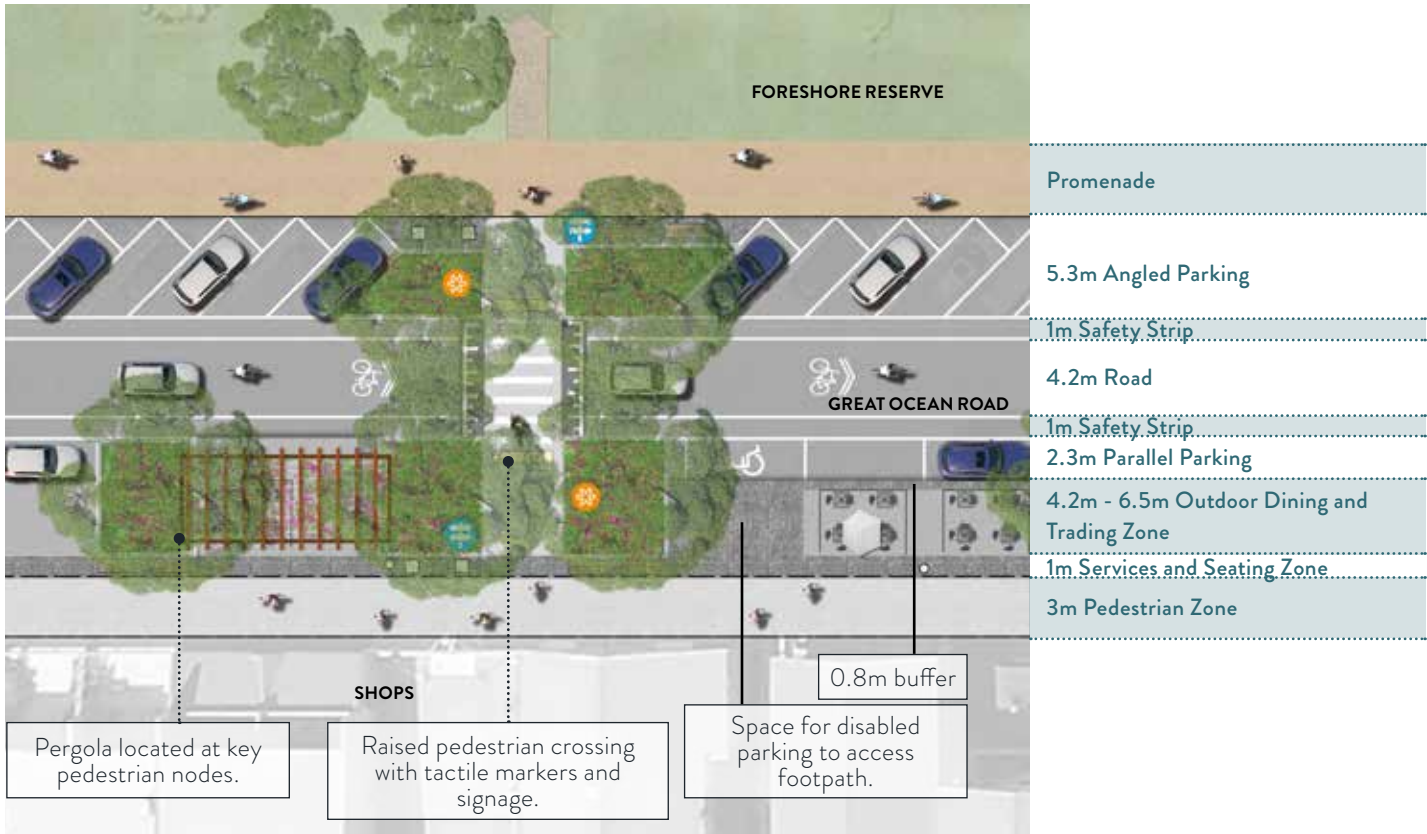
Proposed Plan - Outdoor Dining and Trading Zones - One-Way
